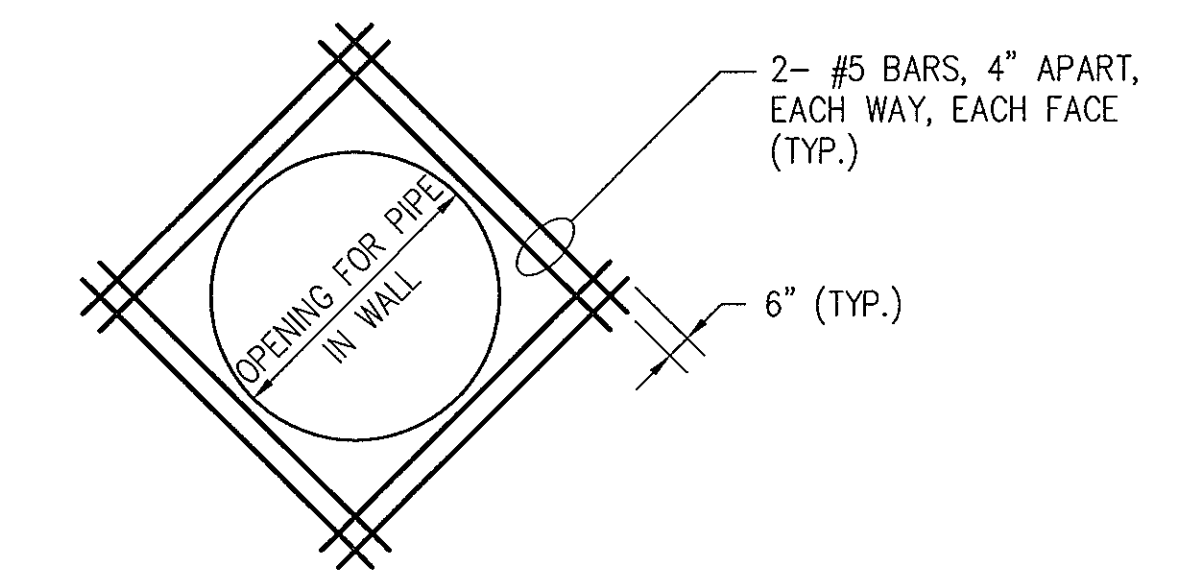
DETAIL A - CULVERT INTERIOR WALL CONNECTION
